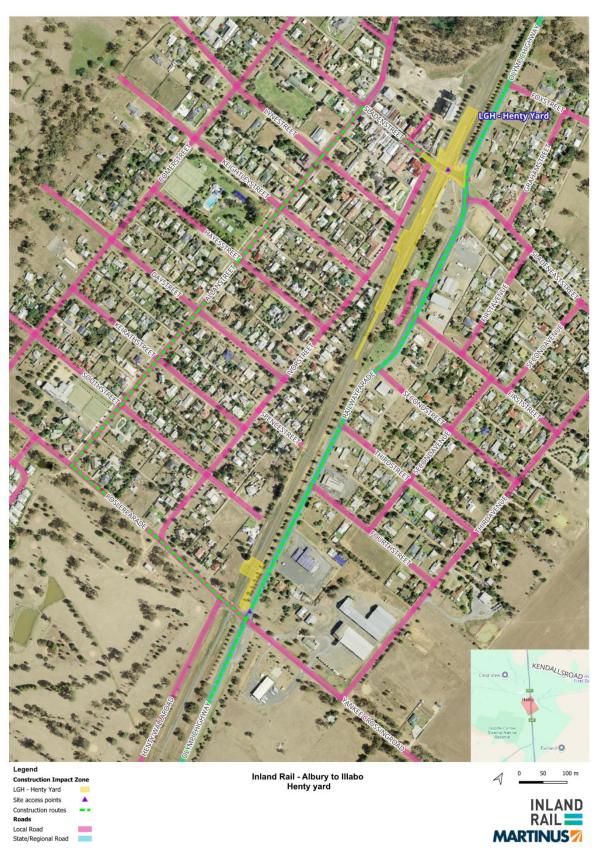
HENTY YARD CONSTRUCTION ROUTES
